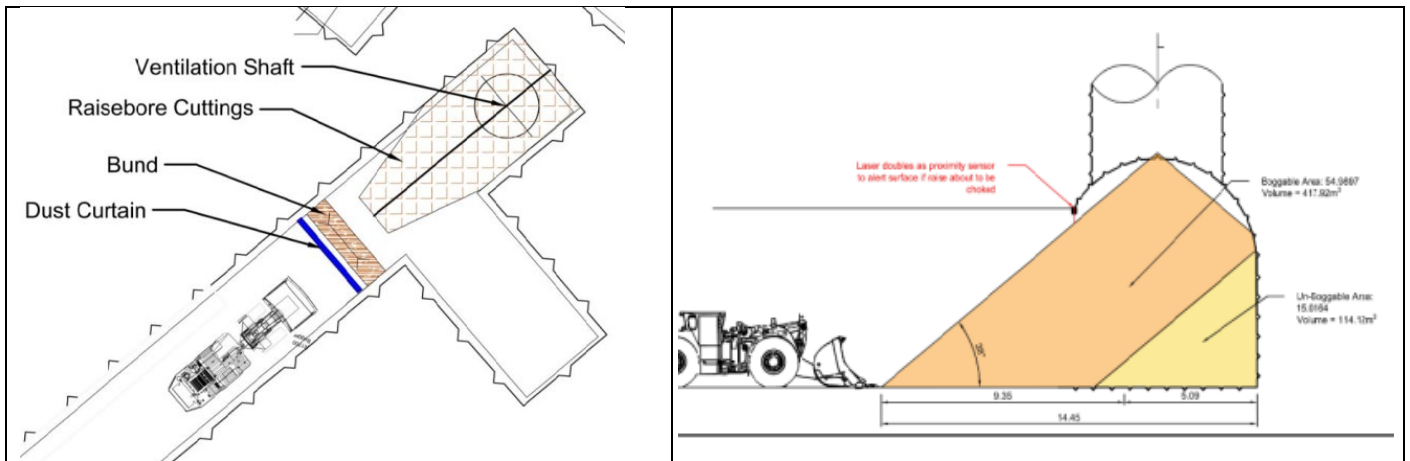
Mucking Operations (from left to right: Plan view of typical mucking operation at the base of the shaft; Section view of cuttings that have built up at the base of the shaft and spilling out to allow the bogger to remove the cuttings safely (orange zone) without passing beneath the shaft itself. As the cuttings are removed, they will ravel to their natural angle of repose and continue spilling forwards. The yellow section highlights the cuttings that cannot be removed whilst the cutterhead remains in the shaft itself)
